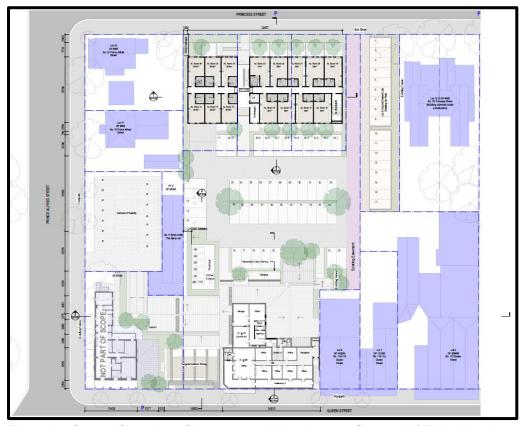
Ground floor plan of the proposed development(Source: H&E Architects).
